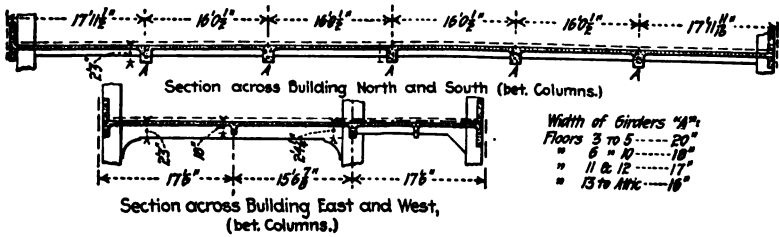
Sections of Tenth Floor of Ingalls Building.
